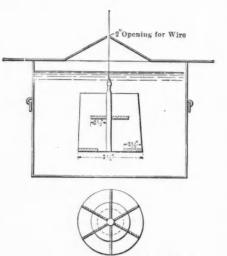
SHOWING DETAILS OF PLUMMET ATTACHED TO END OF WIRE
